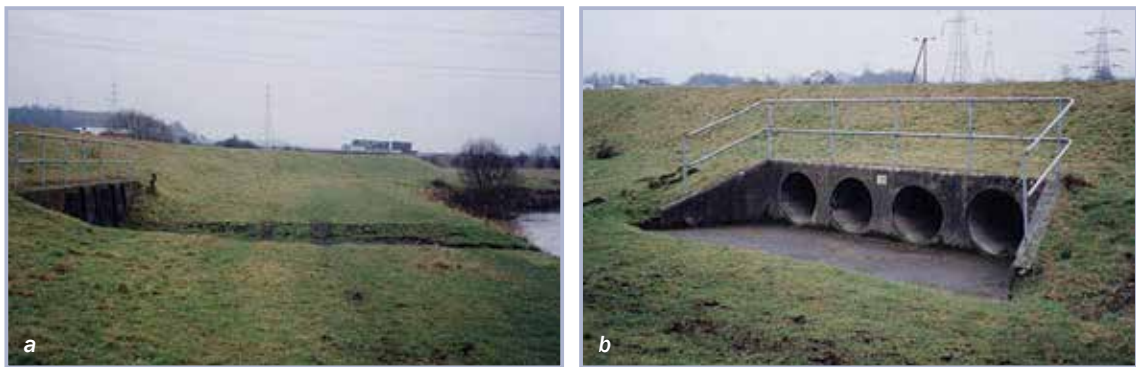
Inward (a) and outward (b) face of outfall structure (courtesy Defra)
